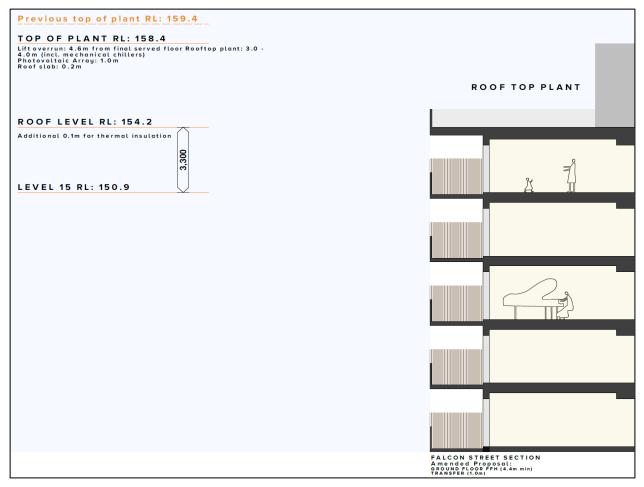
Proposed rooftop plant development section (source: Urban Design Report, Turner)
